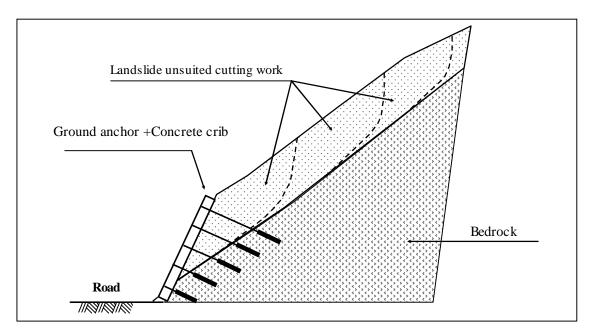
A Typical Example of a Landslide Stabilized with Ground Anchors.
